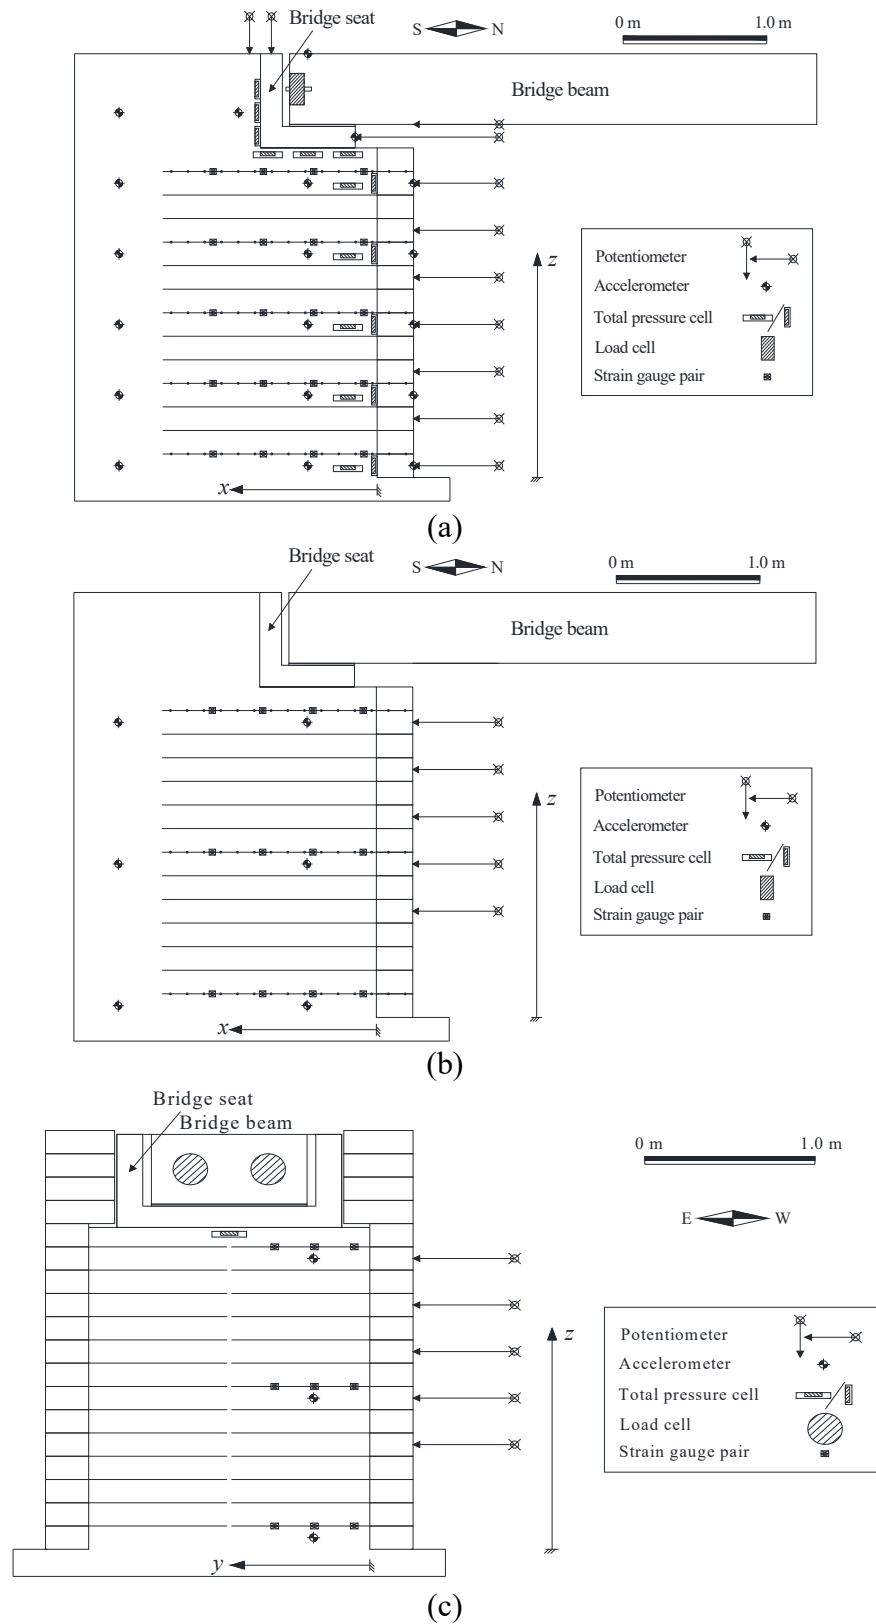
Instrumentation for Specimen 1: (a) longitudinal centerline section L1 ($y = 0.8$ m); (b) longitudinal off-centerline section L2 ($y = 0.35$ m); (c) transverse section T1 ($x = 0.48$ m).
